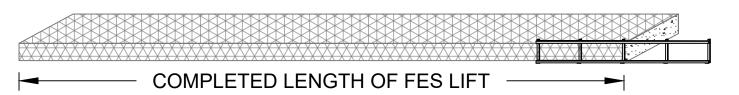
CONSTRUCT FES LIFTS ALONG LENGTH OF FIRST SET OF FORMS AND THEN BEGIN PLACEMENT OF FORMS AND CONSTRUCTION OF SECOND LIFT.
